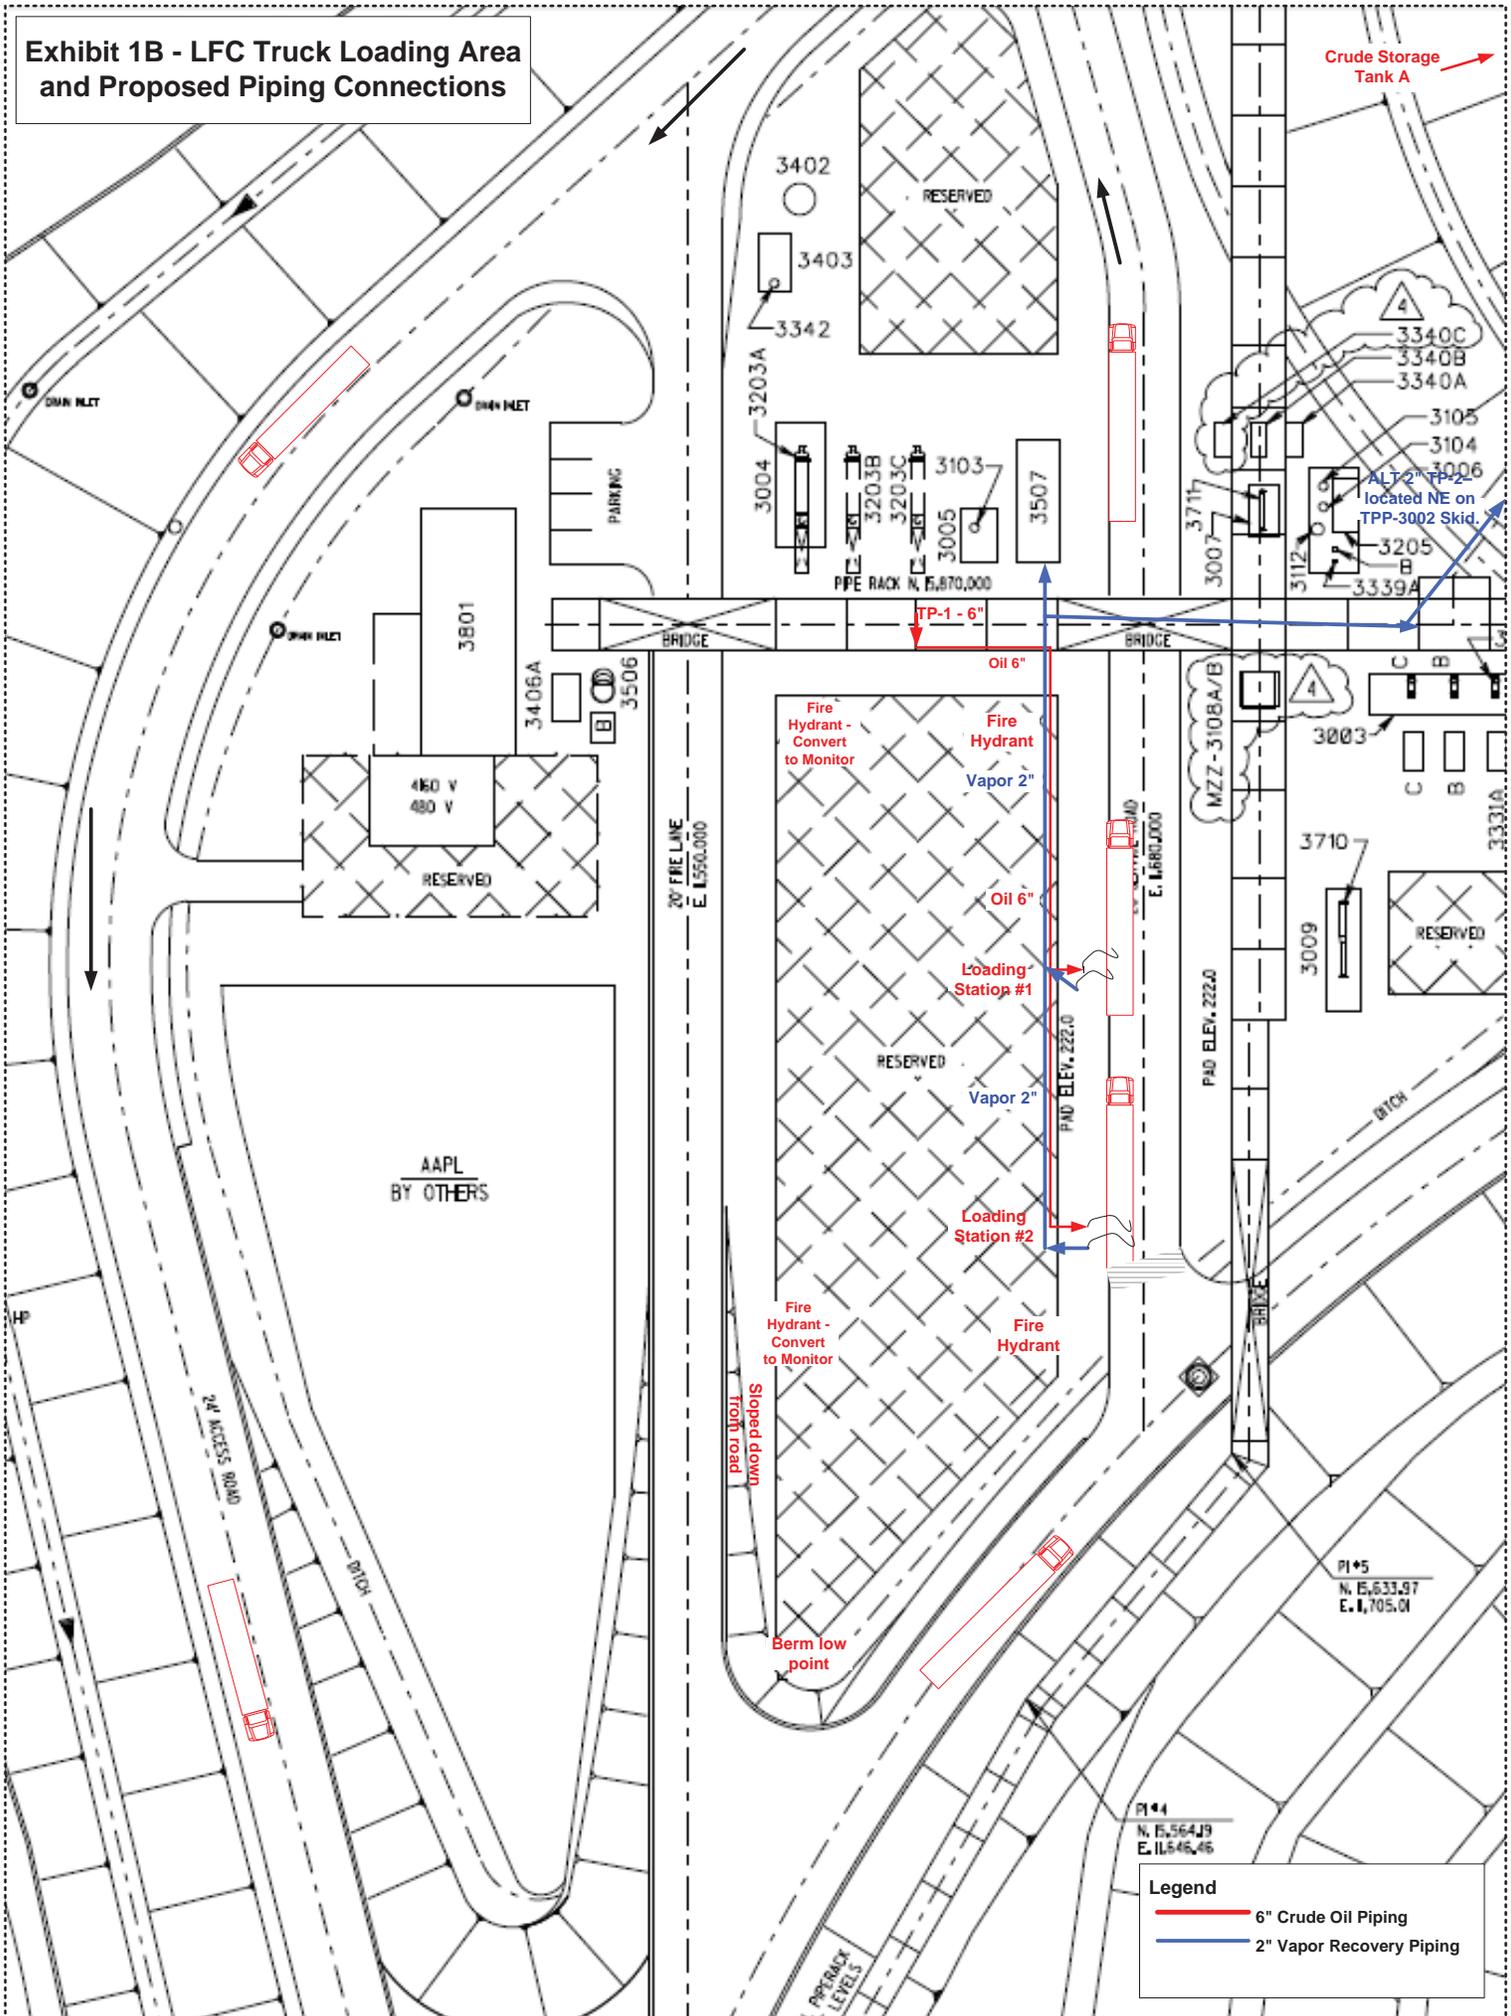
B - LFC Truck Loading Area and Proposed Piping Connections
